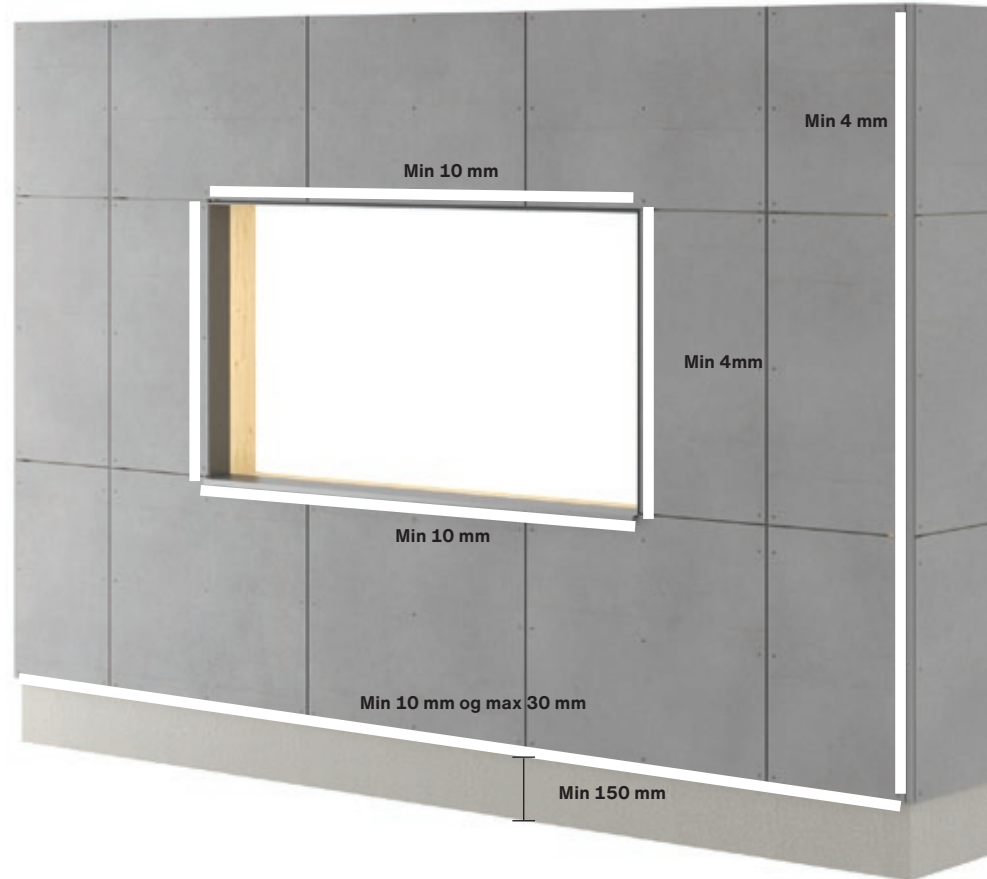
Incorrect installation of Swisspearl facade boards at windows, doors and openings.
